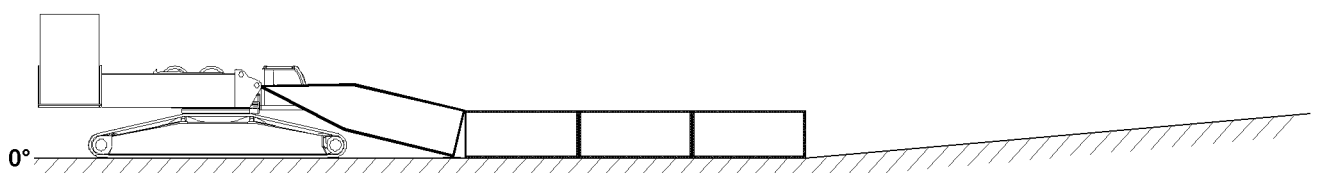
Disassembling and removing the boom - intermediate sections with the end section
